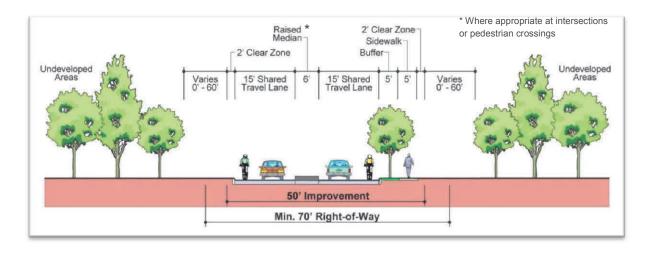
Typical Section from Magothy Bridge Road to Ritchie Highway (MD 2) – (Segment 4)
